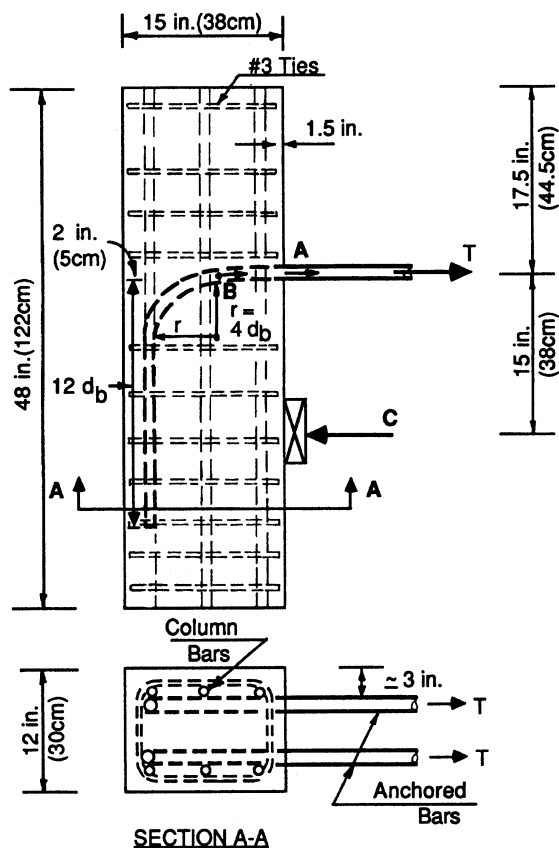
Specimens with #11 (36 mm) hooked bars, #3 (10 mm) ties at 6 in. (15 cm) in joint region
